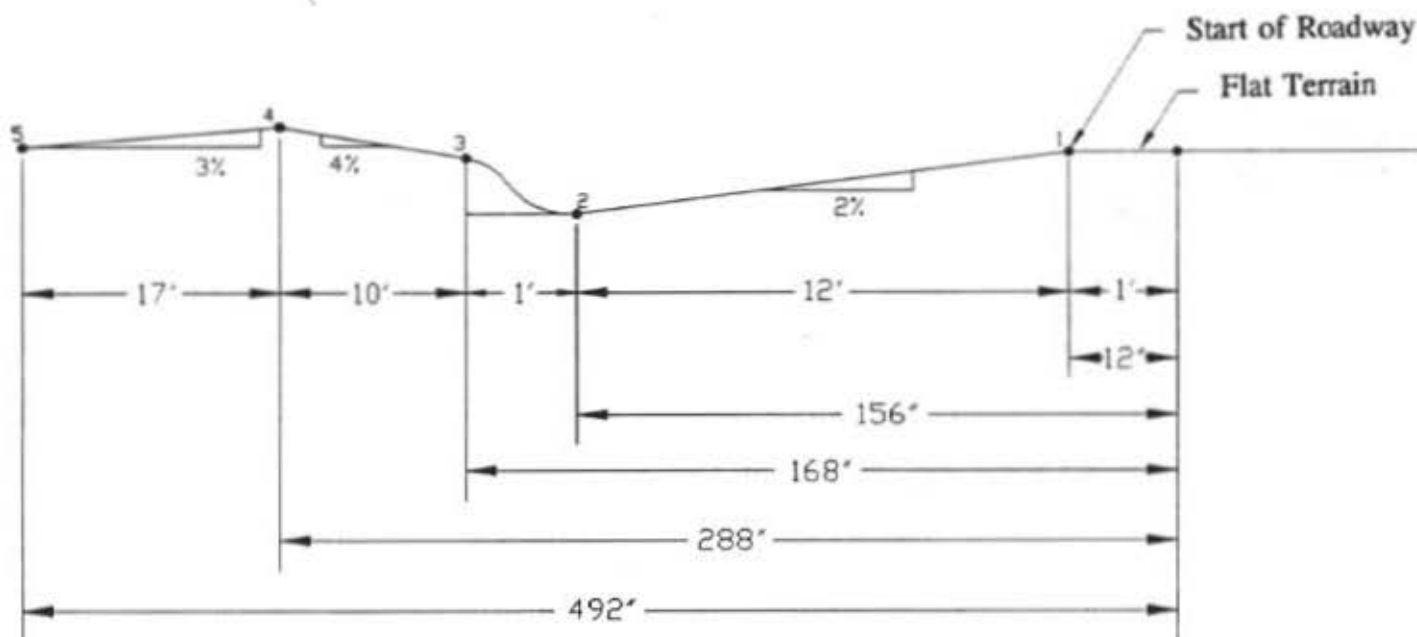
6-in. Type I Mountable Curb and Roadway Cross Section
